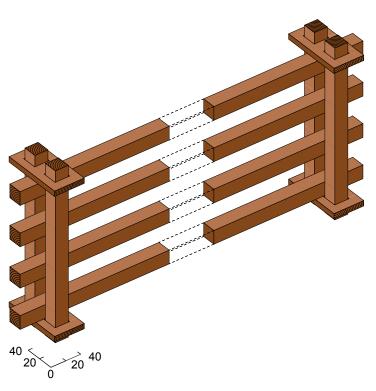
Nuristan. Afghanistan. System of a pik \bar{u} construction.
